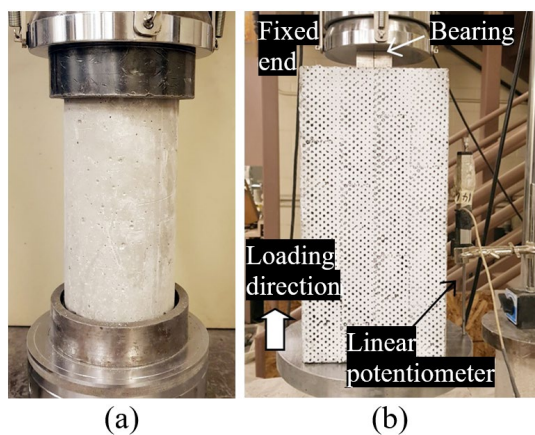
Test protocol: (a) concrete cylinder; (b) anchorage zone element
